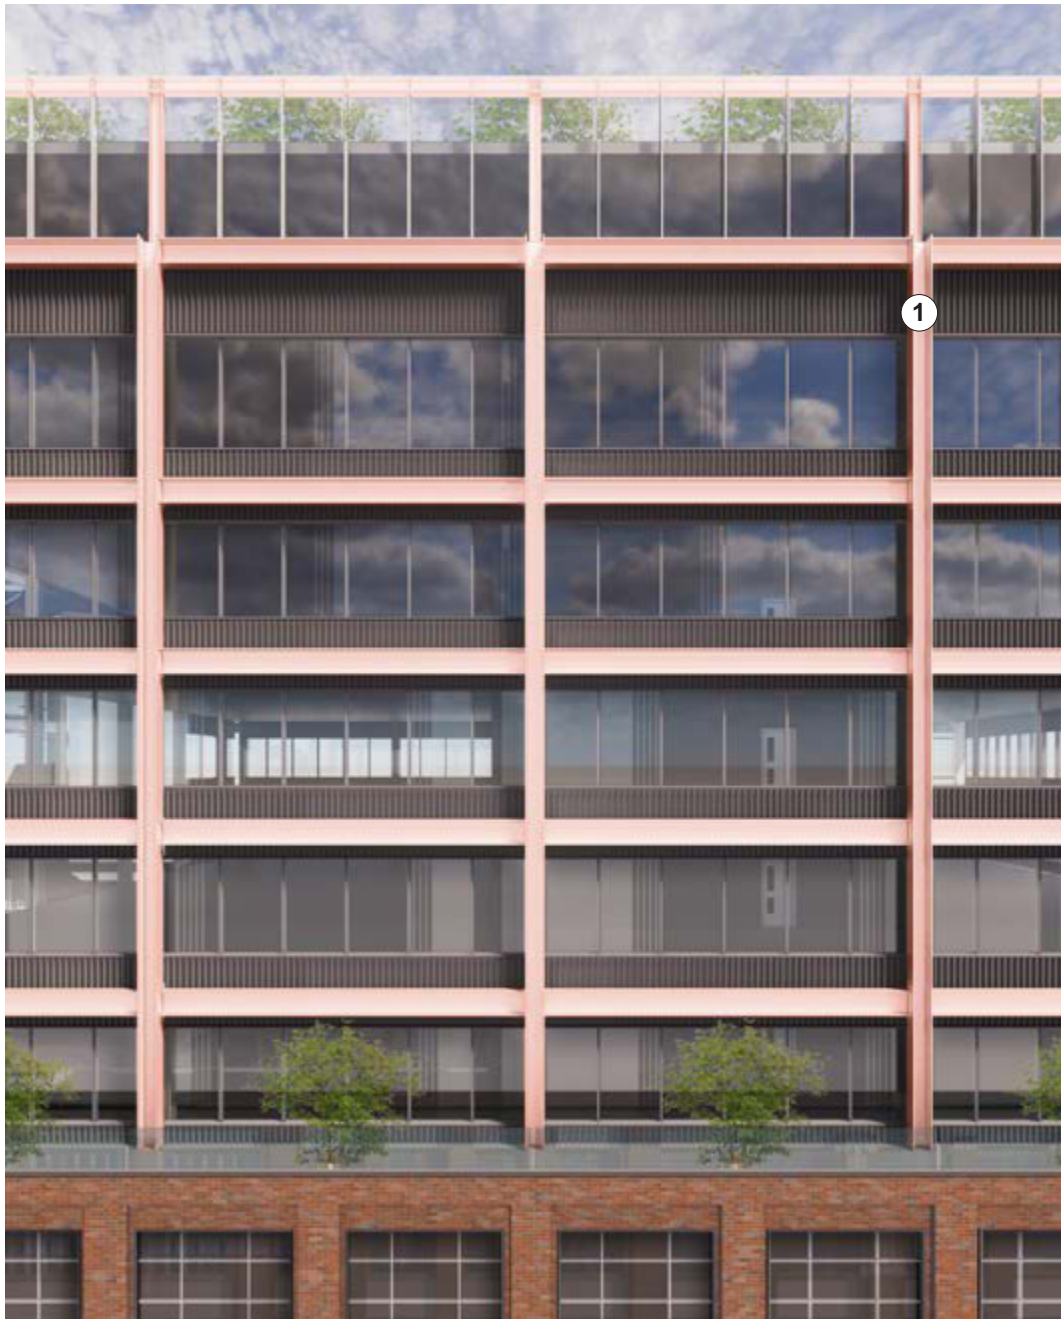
Elevation bay study, plinth, body, crown.
